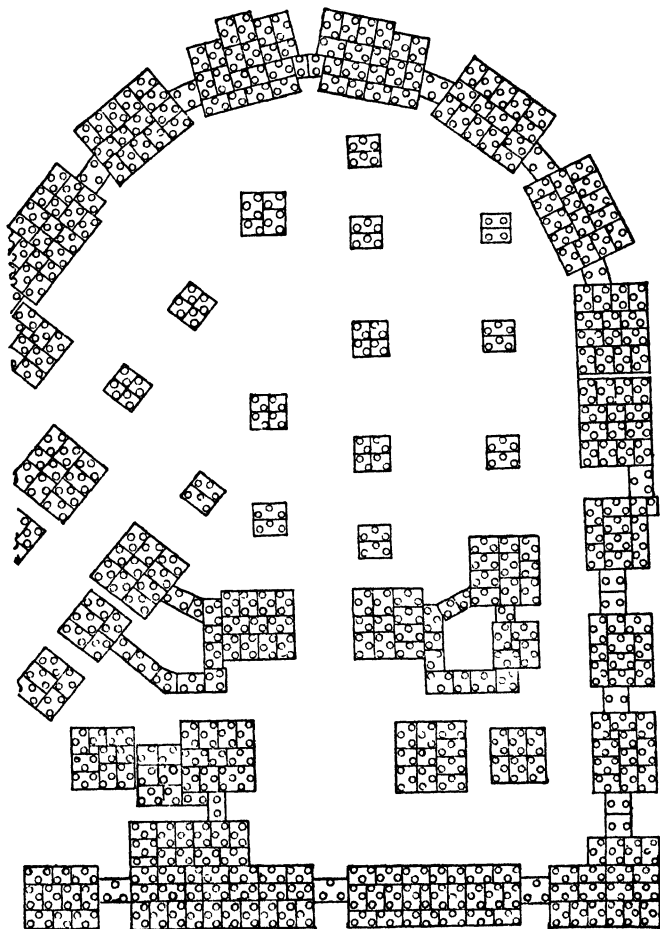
Piling-plan, Chamber of Commerce Building, Boston, Mass.
